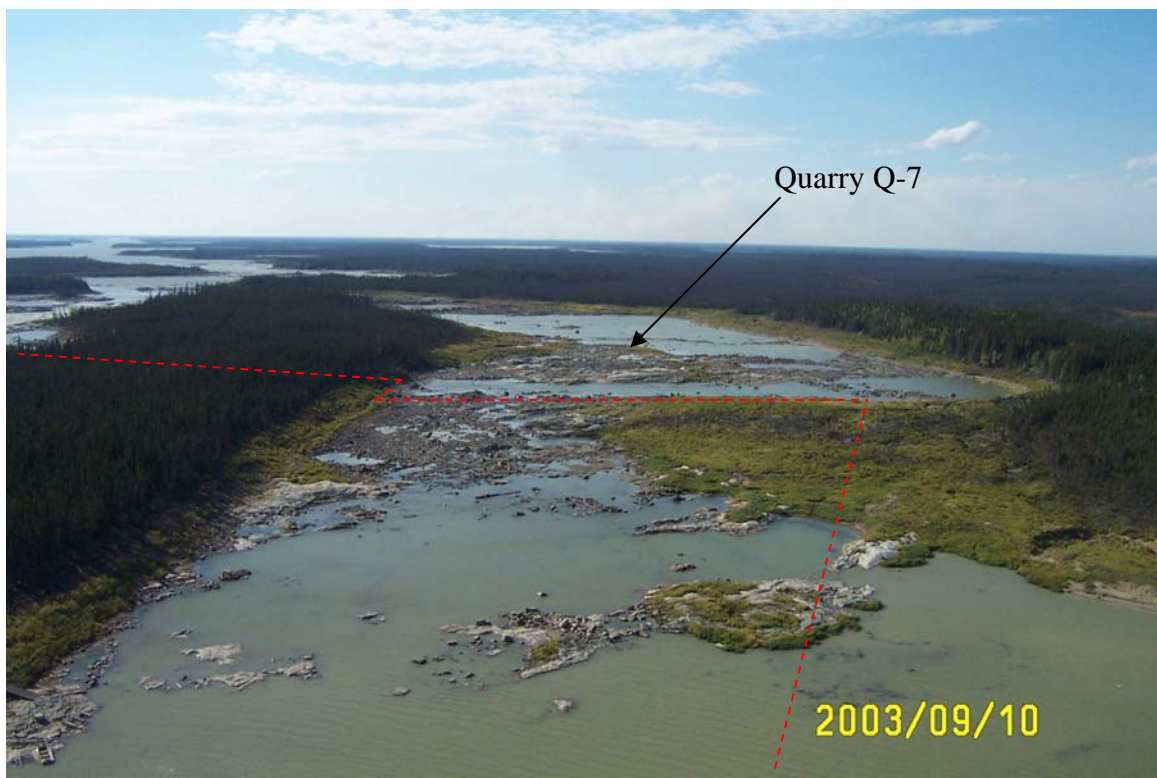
View looking west, showing Powerhouse Intake Channel Area and Rock Quarry Q-7.
